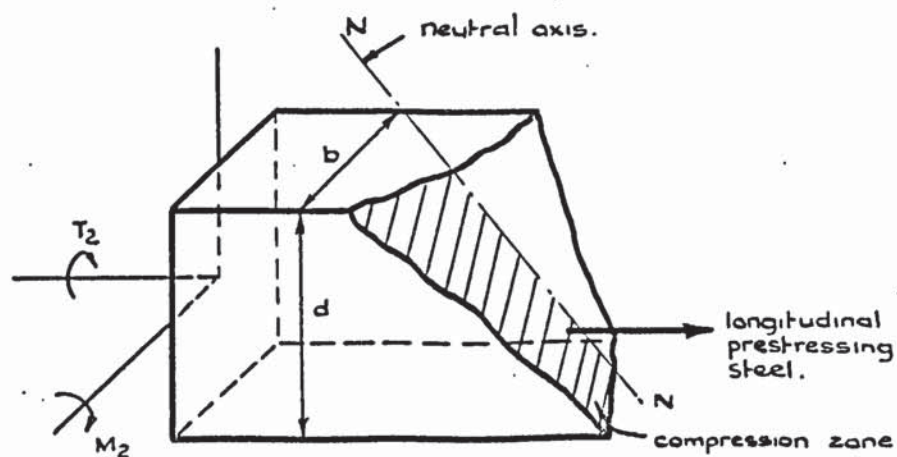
Mode 2 type of failure in prestressed concrete (trapezoidal failure plane.)
